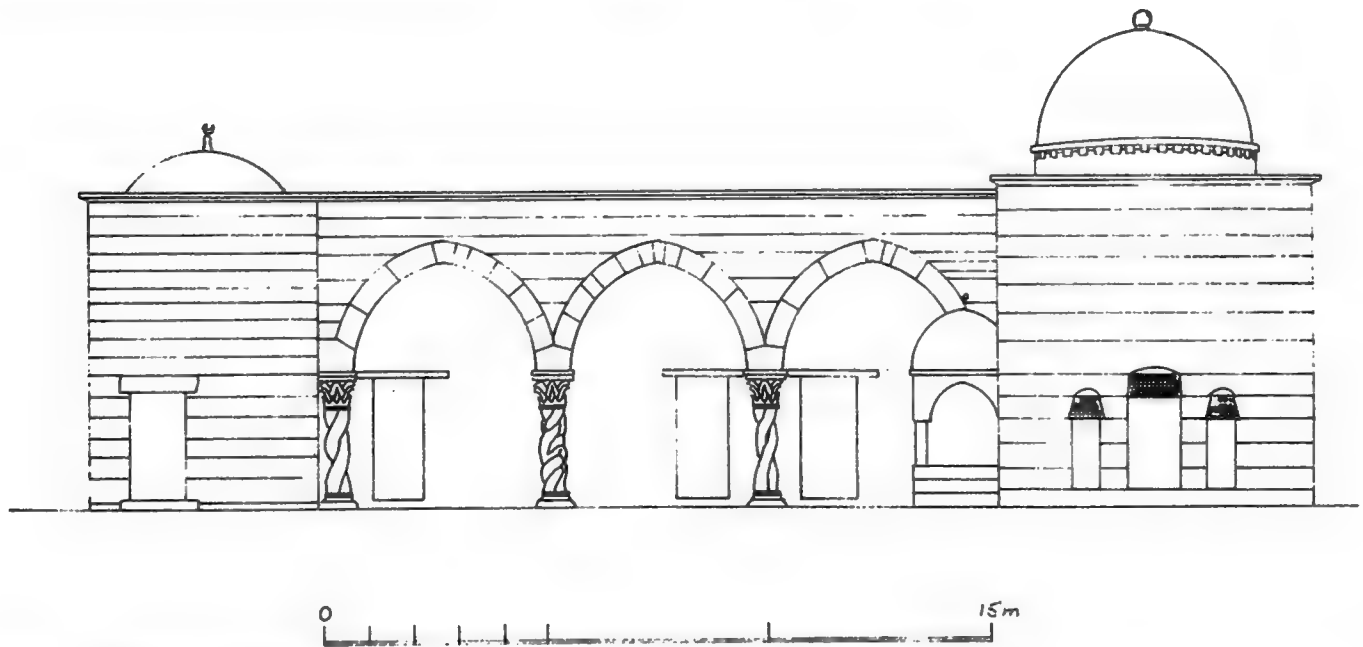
Madrasa al-Nahawiyya, sketch of reconstruction of the north façade (second phase).
